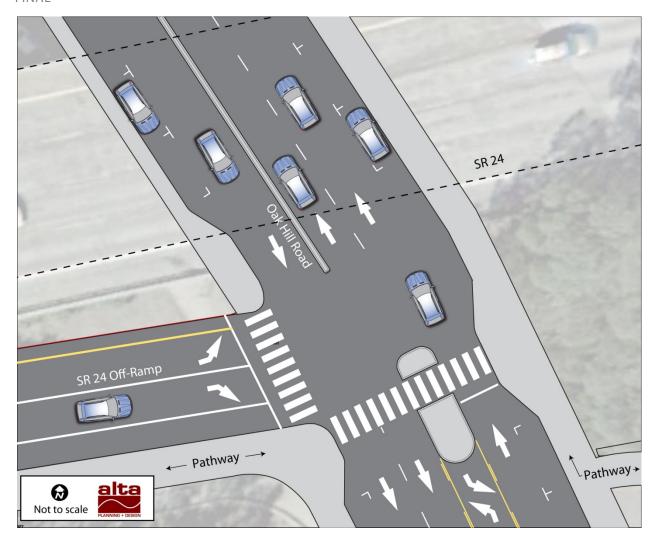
Plan View of Oak Hill Road at SR 24: Option 3
